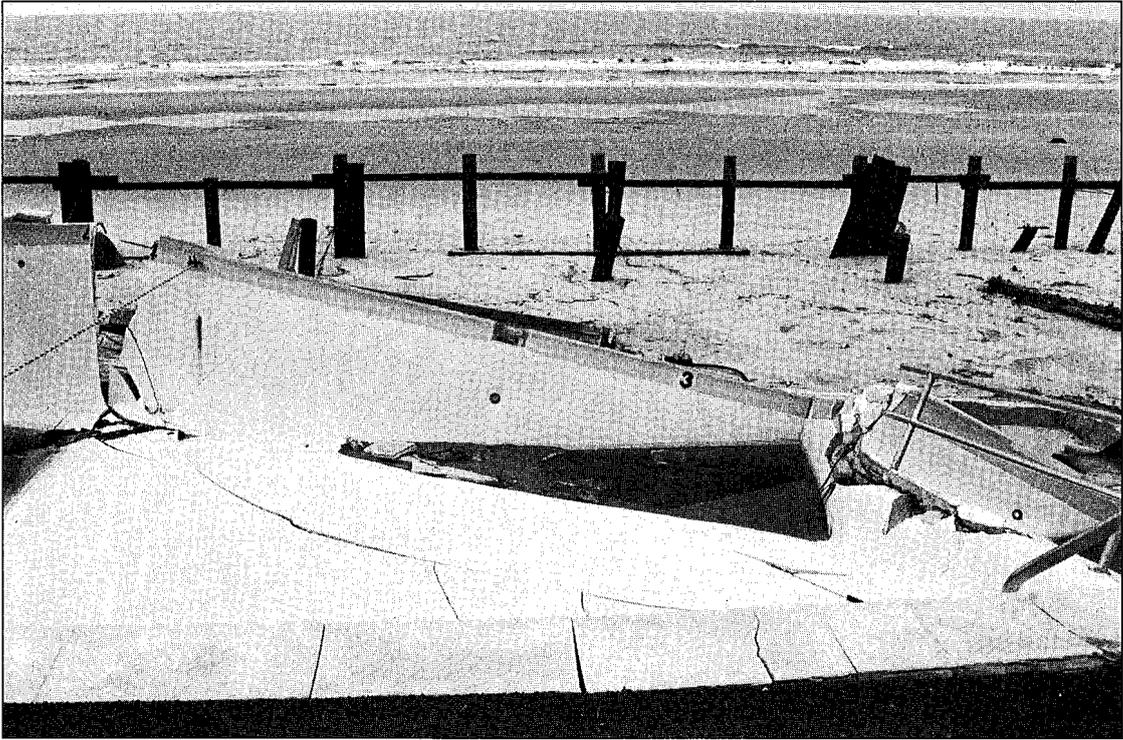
Sand dunes were washed away, exposing retaining walls and pools to the storm surge.
